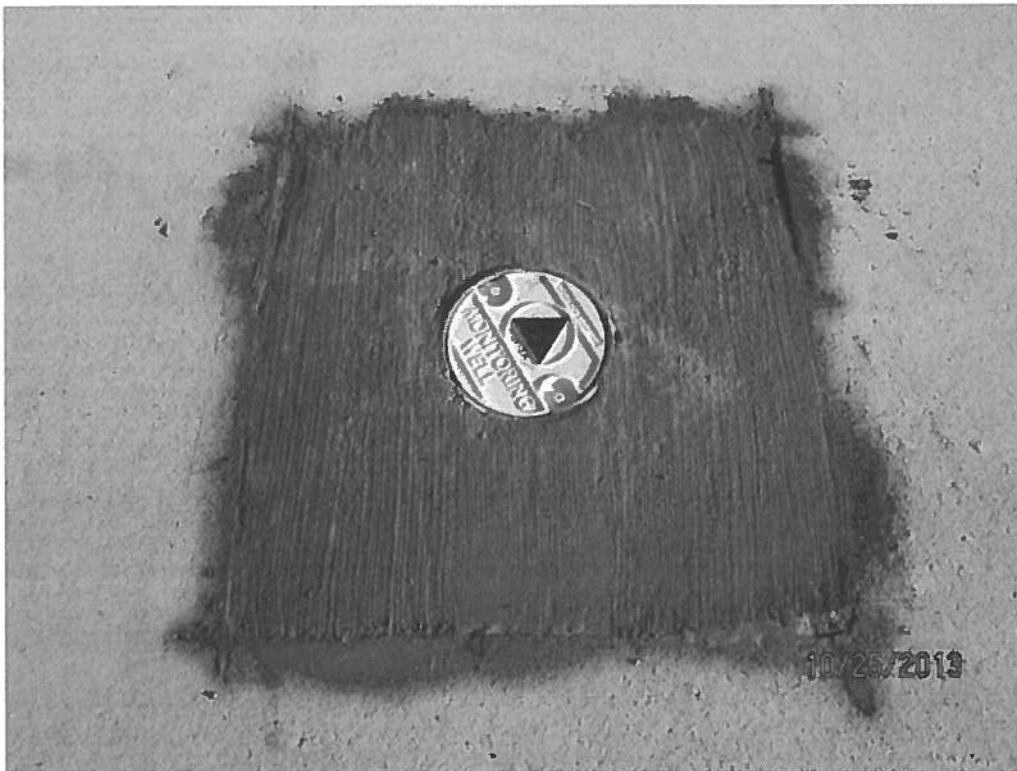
View of MW-2A, showing location near propane tank near northwest corner of site building.
